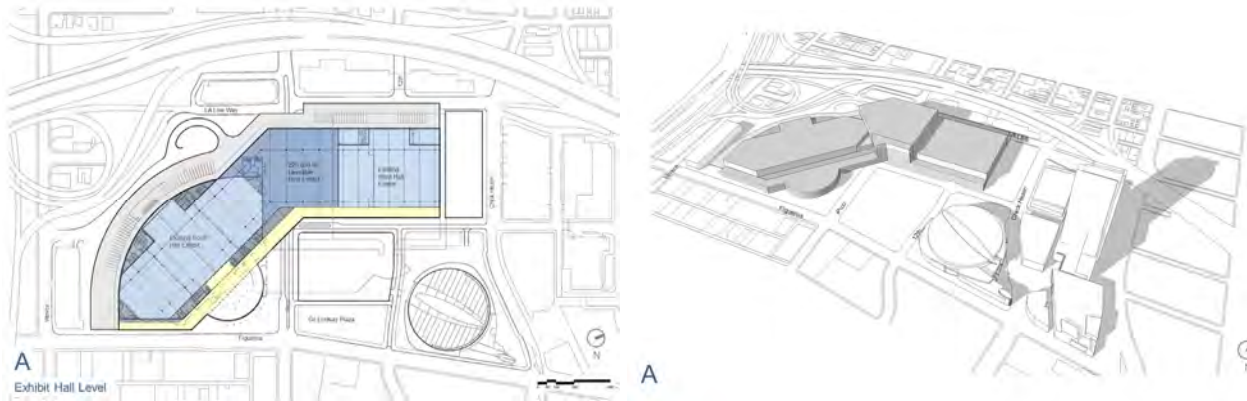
Exhibit level floor plan and massing – concept design scheme A (220,000ft<sup>2</sup> of net new indoor exhibit space)
